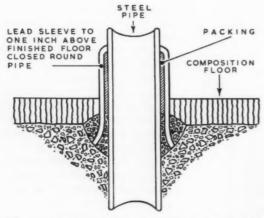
Lead sleeve protection for steel pipes in composition floors.
